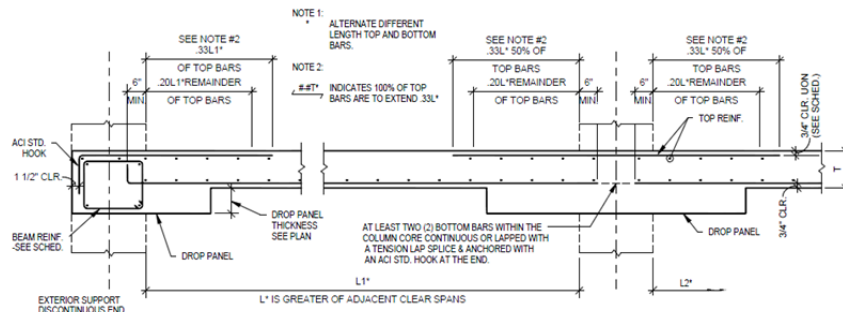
TYPICAL COLUMN STRIP DETAIL WITH DROP PANEL AND EDGE BEAM
